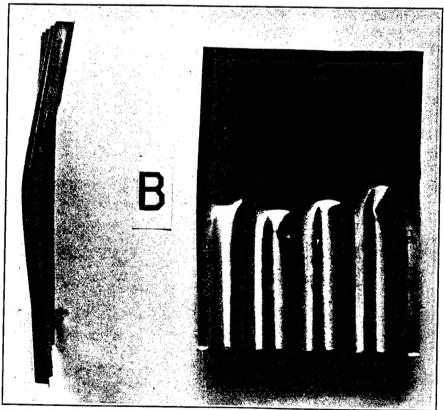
Column Failure of Corrugated Sheet.
